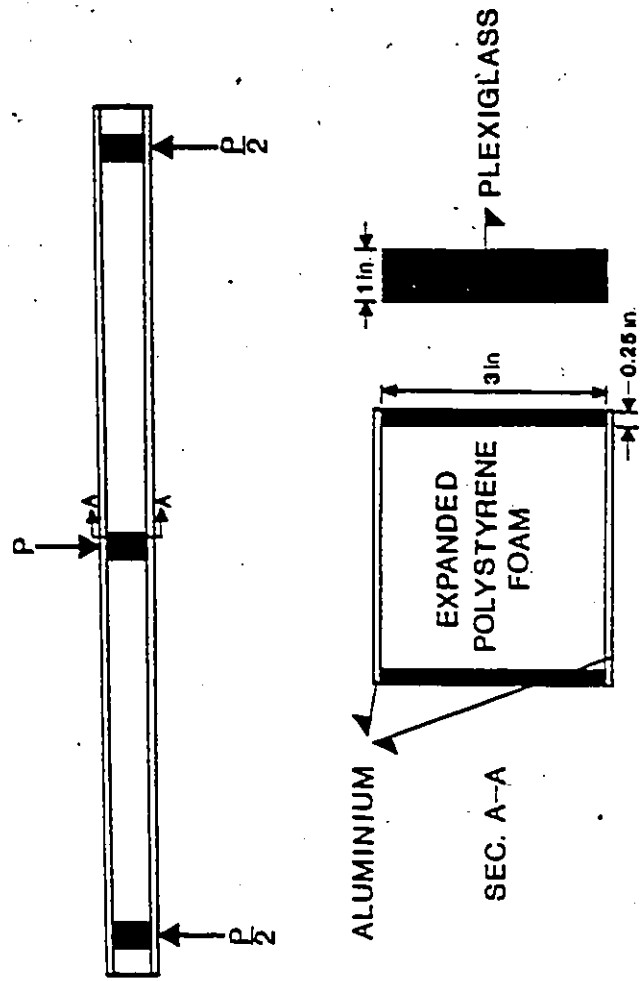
TYPICAL STIFFENERS USED AT LOADING AND SUPPORT POINTS
